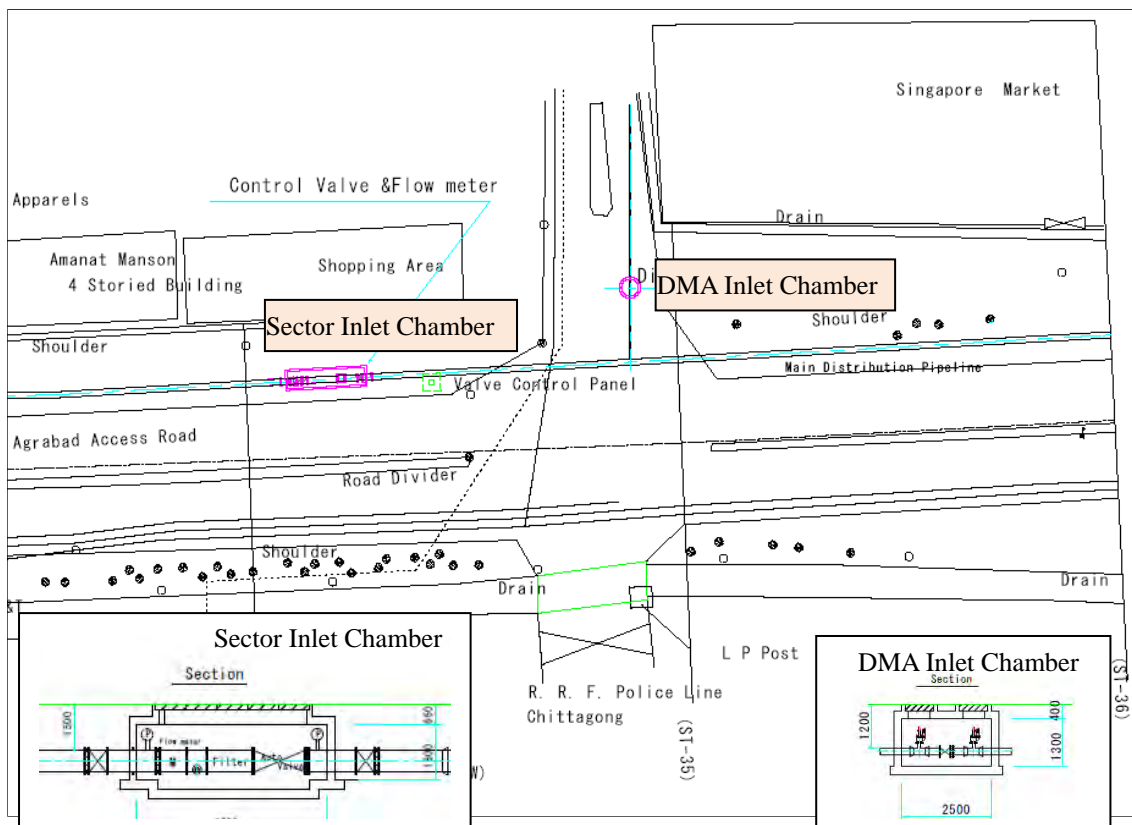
Location of the Manholes at Sector Inlet and the District Metered Area
